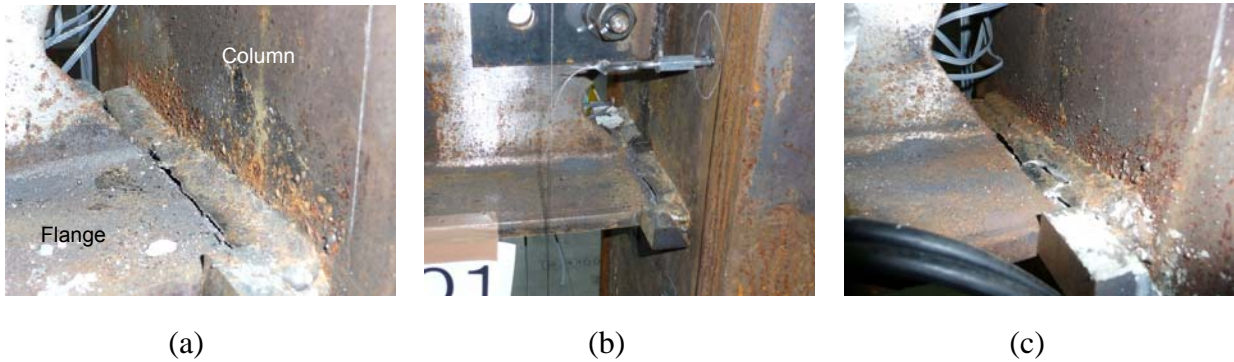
Fractures of field weld connections: (a) The second floor connection; (b) The third floor connection; (c) The fourth floor connection
